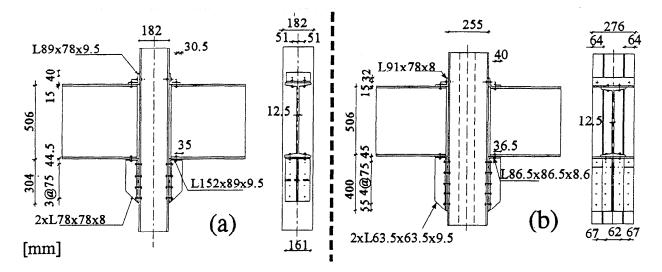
Detail of riveted stiffened seat angle connections: (a) Single column detail; (b) built-up column detail.
